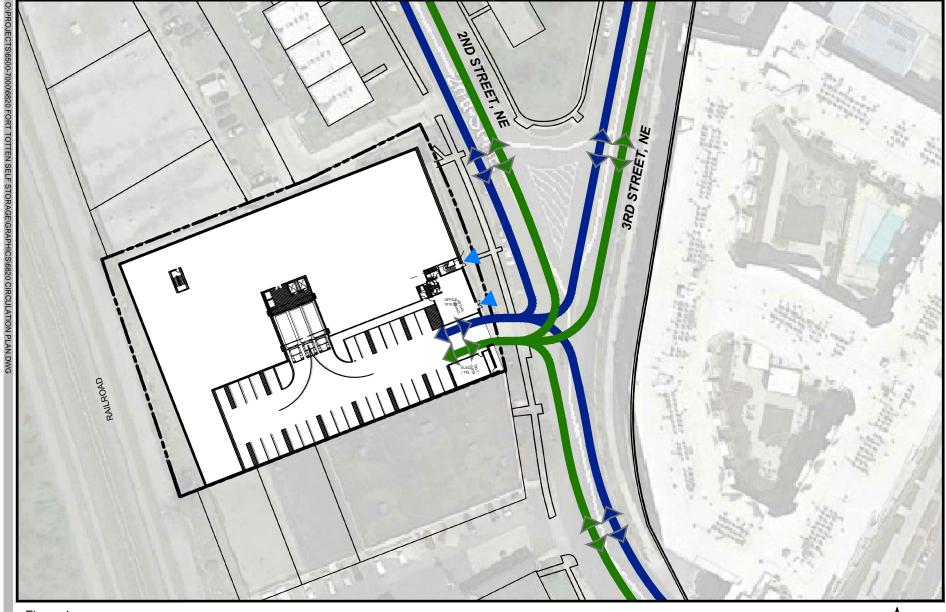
Circulation Plan Fort Totten Storage Center Washington, DC
